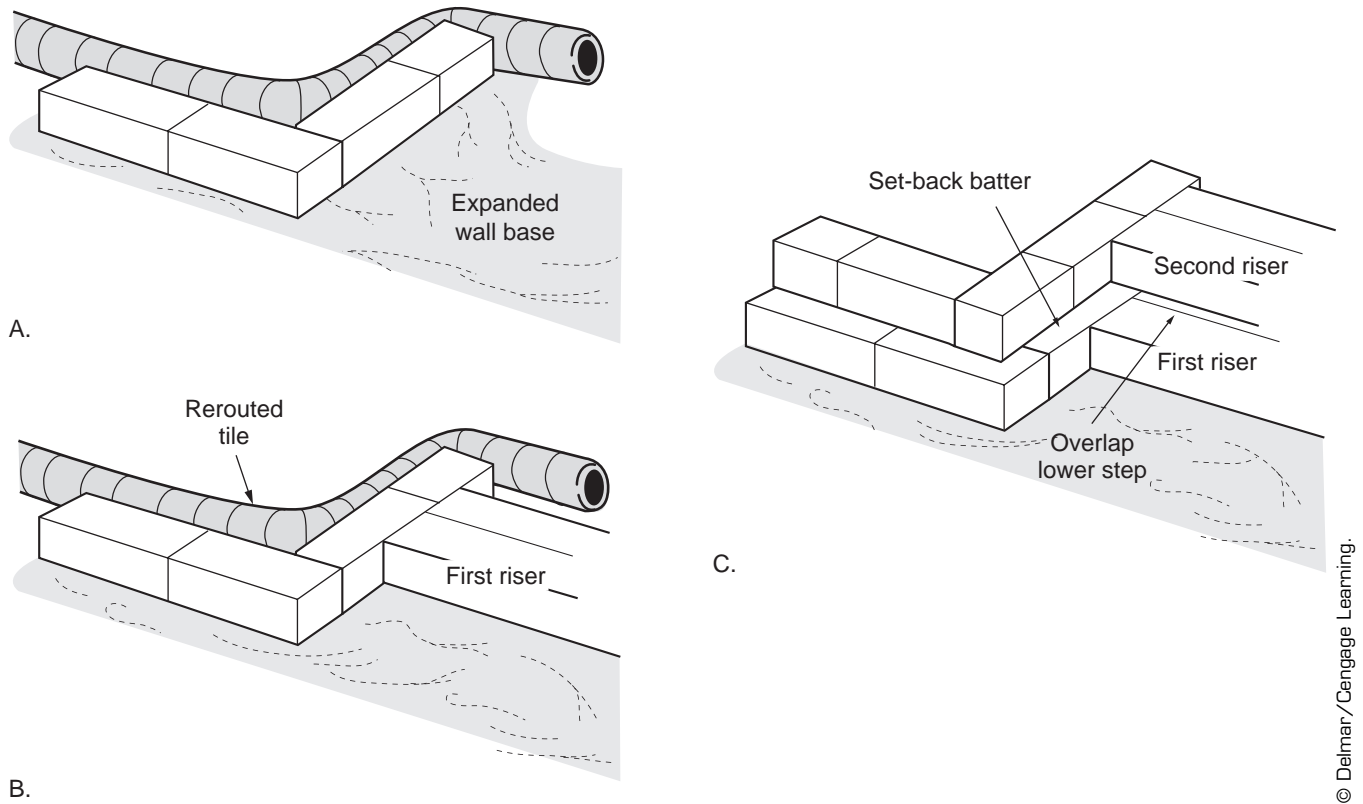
Butt stair construction with segmental precast units. A. First course of wall and a cheek wall for butt stairs. B. First step riser for butt stairs. C. Second course for butt stairs with optional tread surfacing. (Note: First course will be completely or partially buried.)
